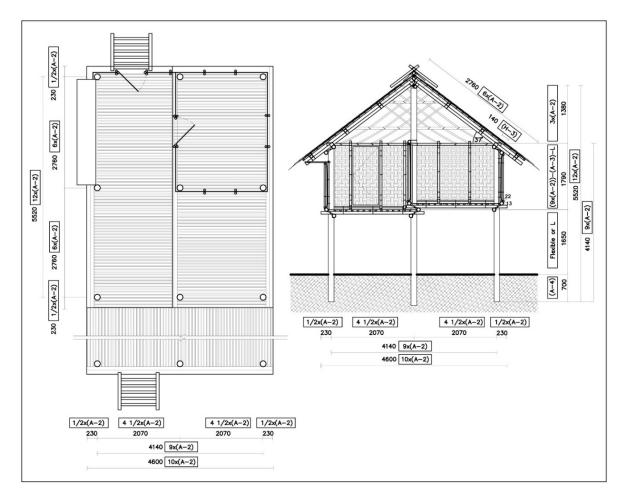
Application units for floor and cross-sectional plan of the Moklen ethnic house
